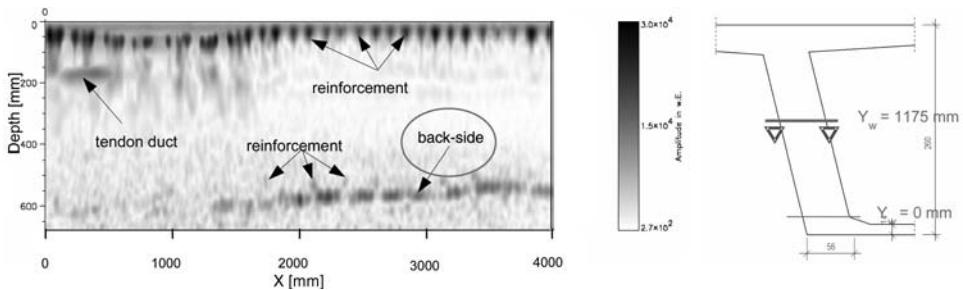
B-scan through the box girder web of the bridge in Germany at the level of $y_w = 1175$ mm from the fused dataset of the reconstructed data of radar and ultrasonic echo.
